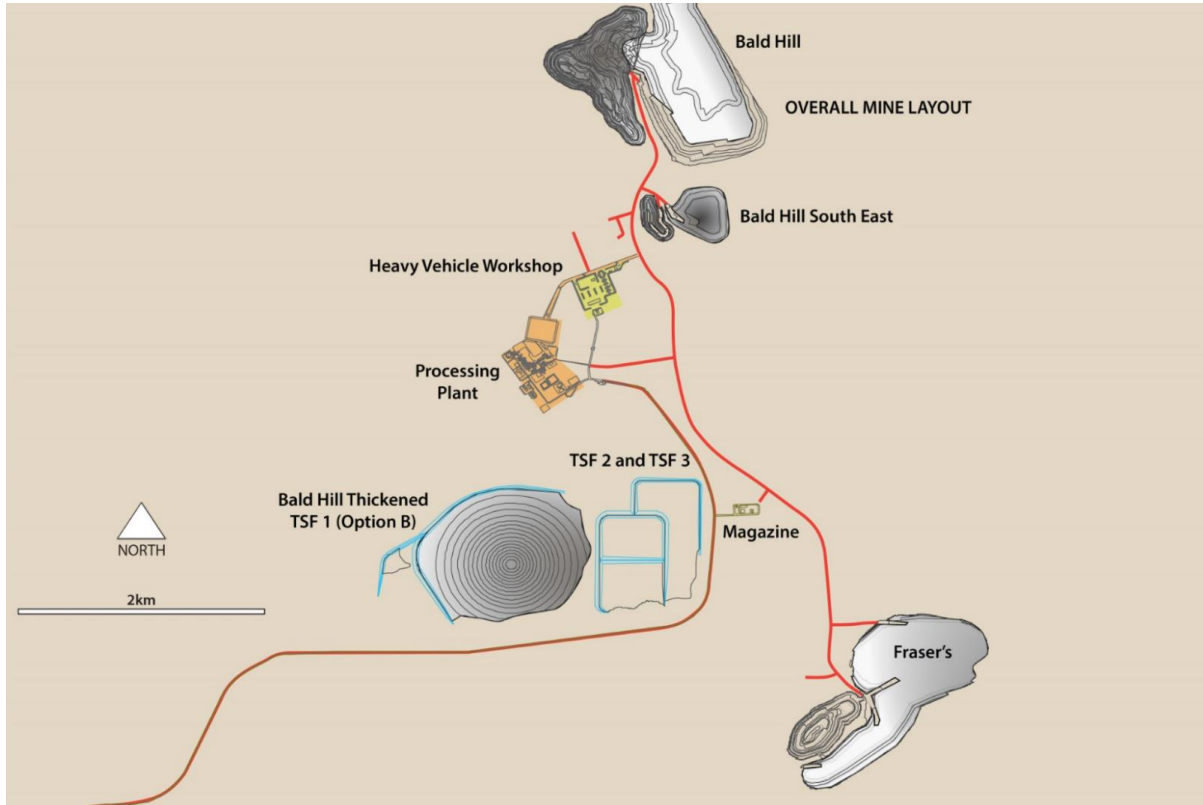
Pit and Waste Dump Designs for Bald Hill and Fraser's, and Plant and Tailings Dam Layouts
